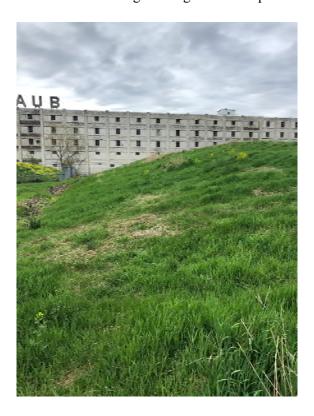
View of Northern side of Landfill and drainage swale.
